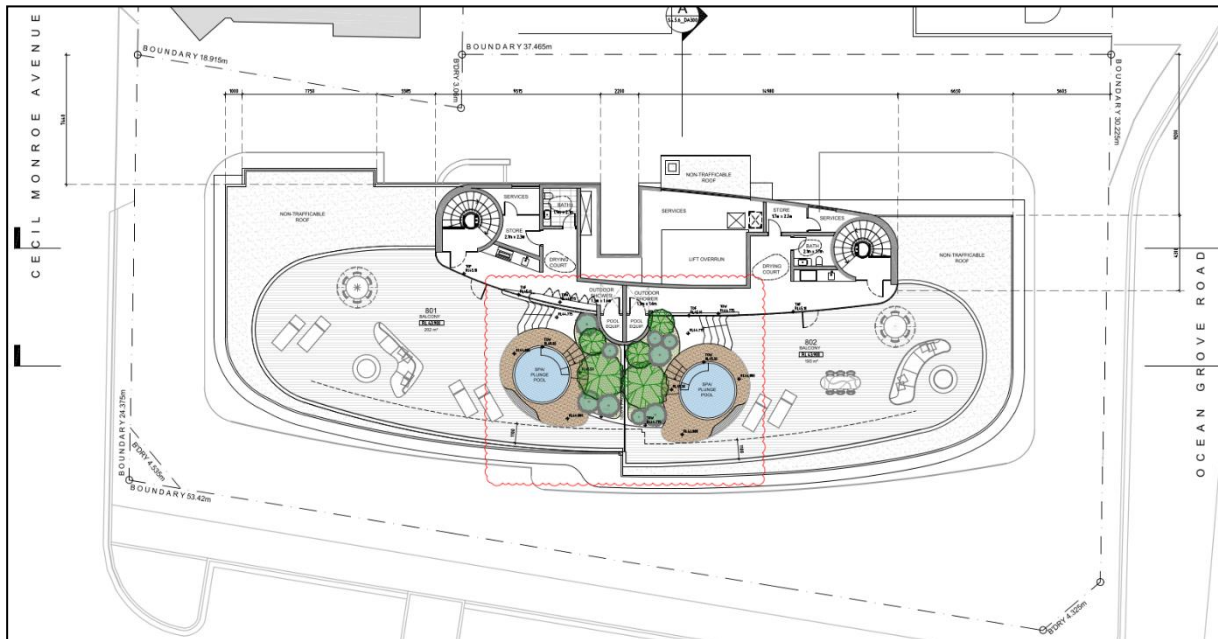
proposed rooftop / pool area (source: Applicant's revision 1 plans)
